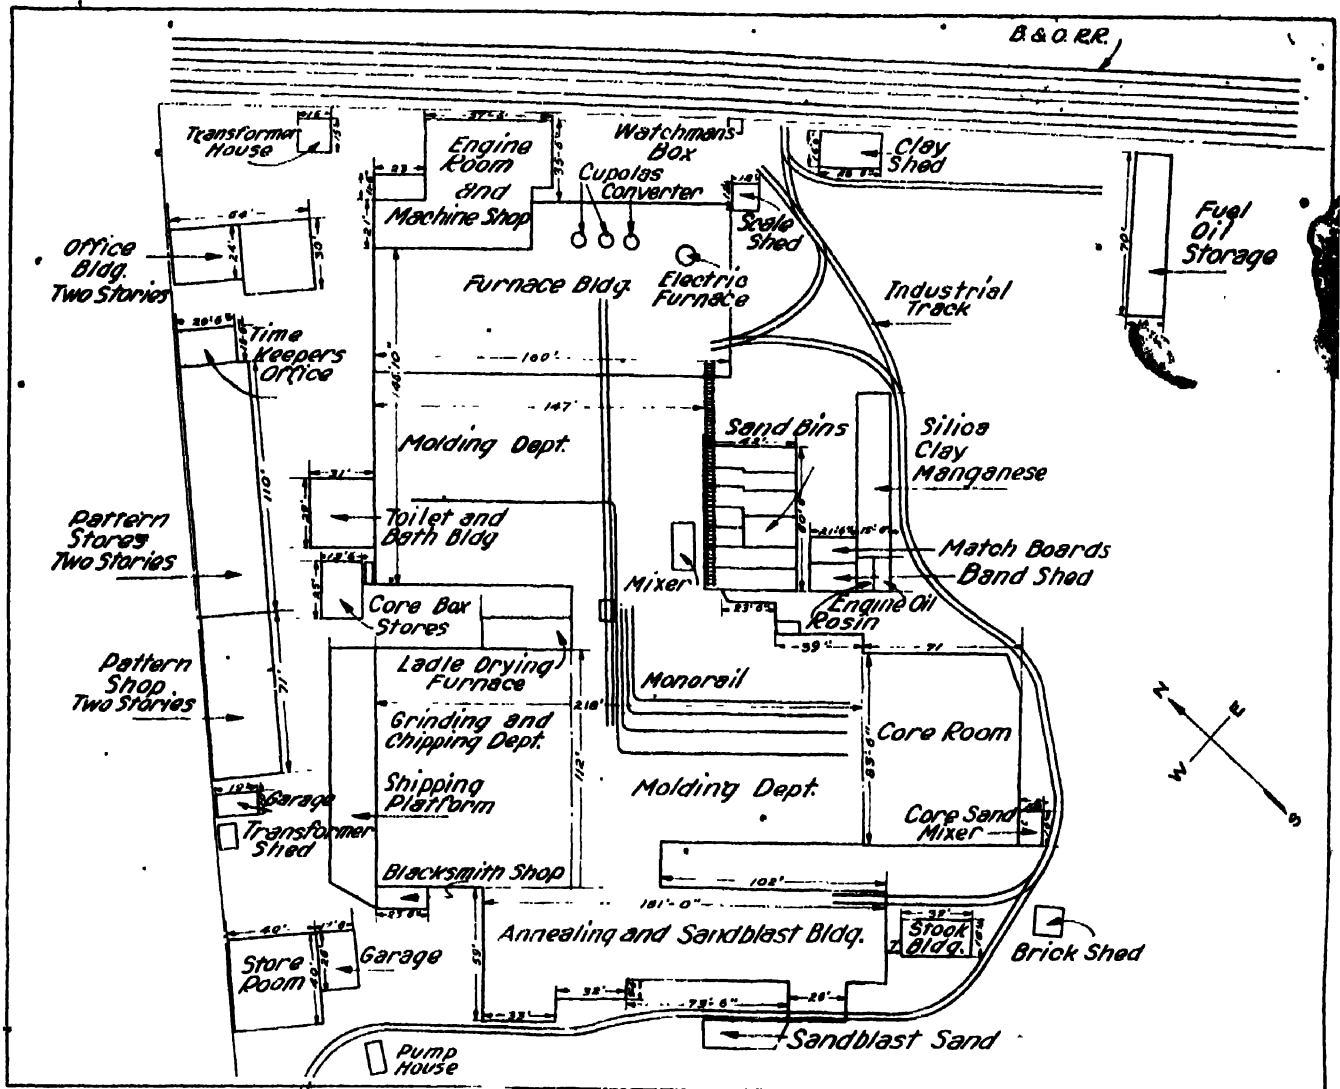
THE FOUNDRY CONSISTS OF A GROUP OF FIVE PARALLEL BUILDINGS LOCATED BESIDE THE RAILROAD RIGHT-OF-WAY--AN INDUSTRIAL TRACK FROM THE FURNACE ROOM TO THE POURING STATION SERVES TO CONVEY THE MOLTEN METAL TO THE MOLDING DEPARTMENT
